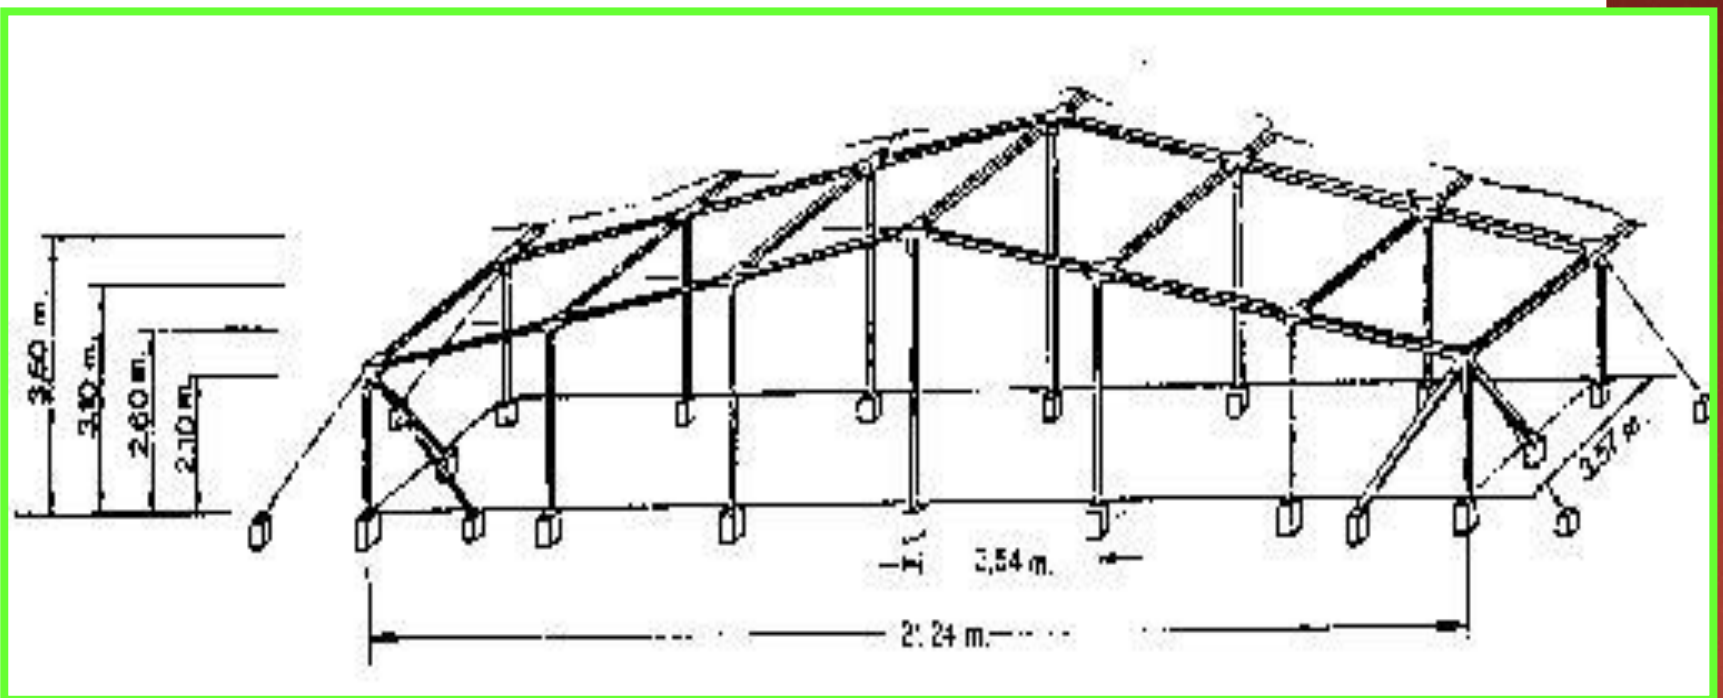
Typical structure of the 'Parral-type' greenhouse in Almeria (Spain)
